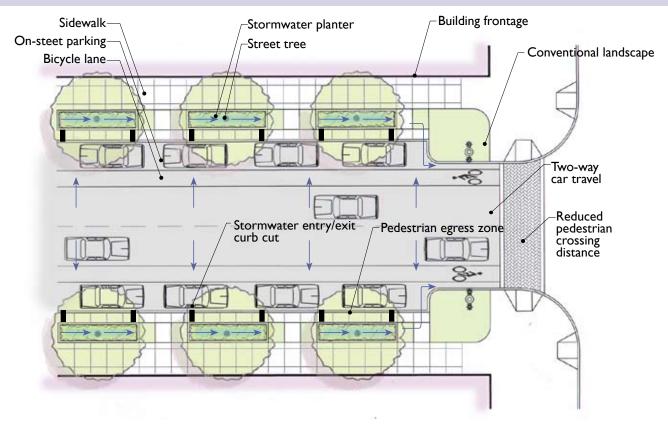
Stormwater Planters With On-Street Parking-Plan View
